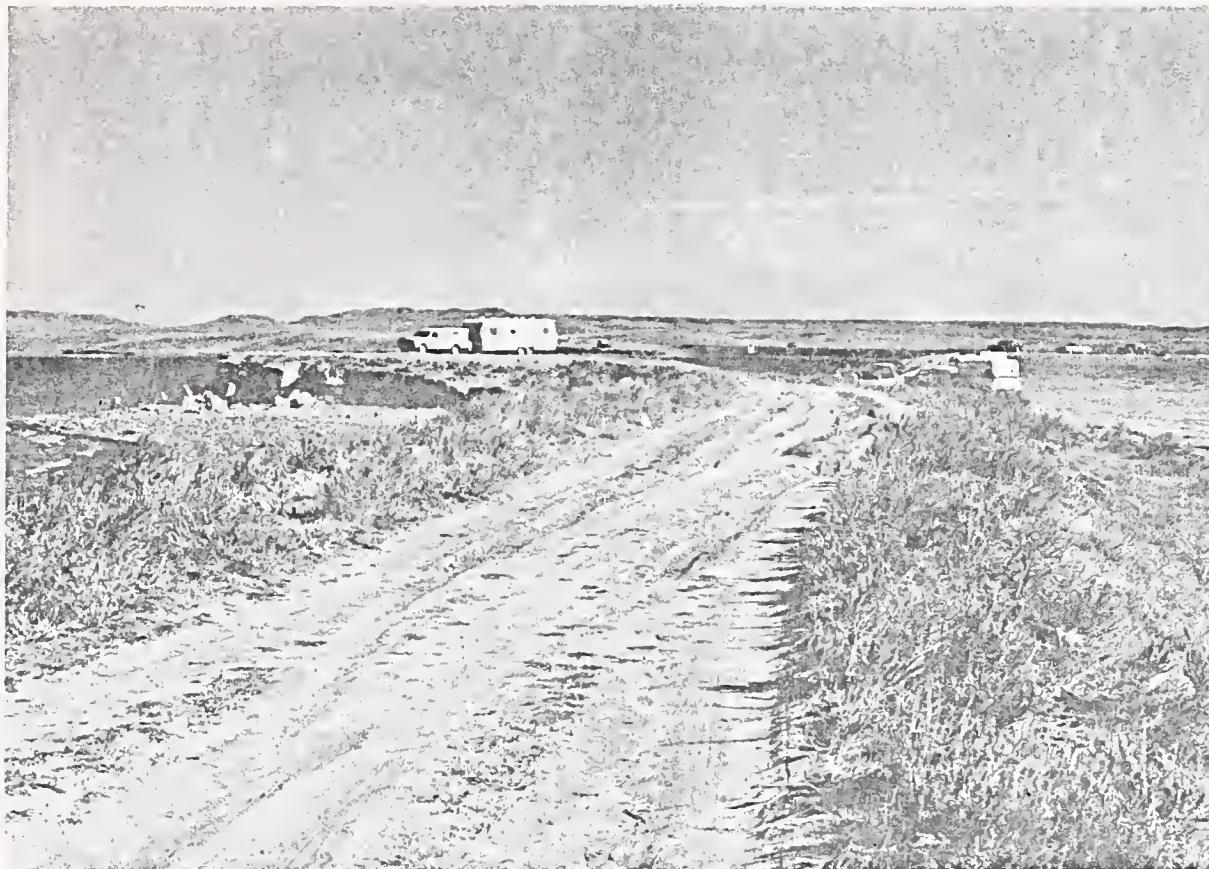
Right Bank of Spillway and Spur Dike
